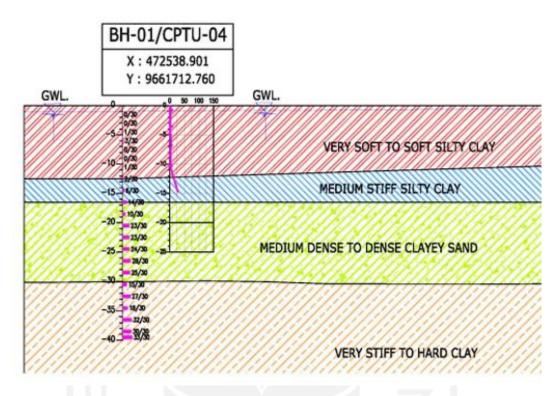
Soil Profile in the Construction Site at Section BH-01 (Source: PT. Hutama Karya Infrastruktur)
